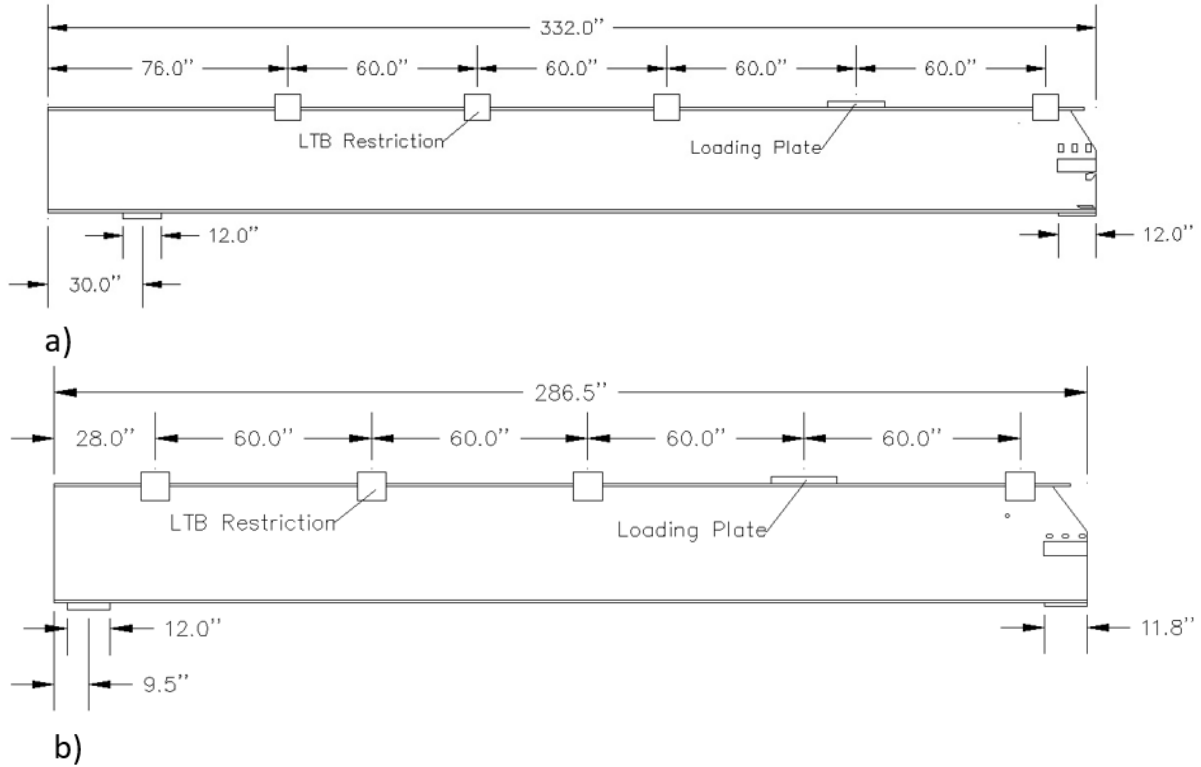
Exact experimental configuration and dimensions for (a) Specimen 1 and (b) Specimen 2
